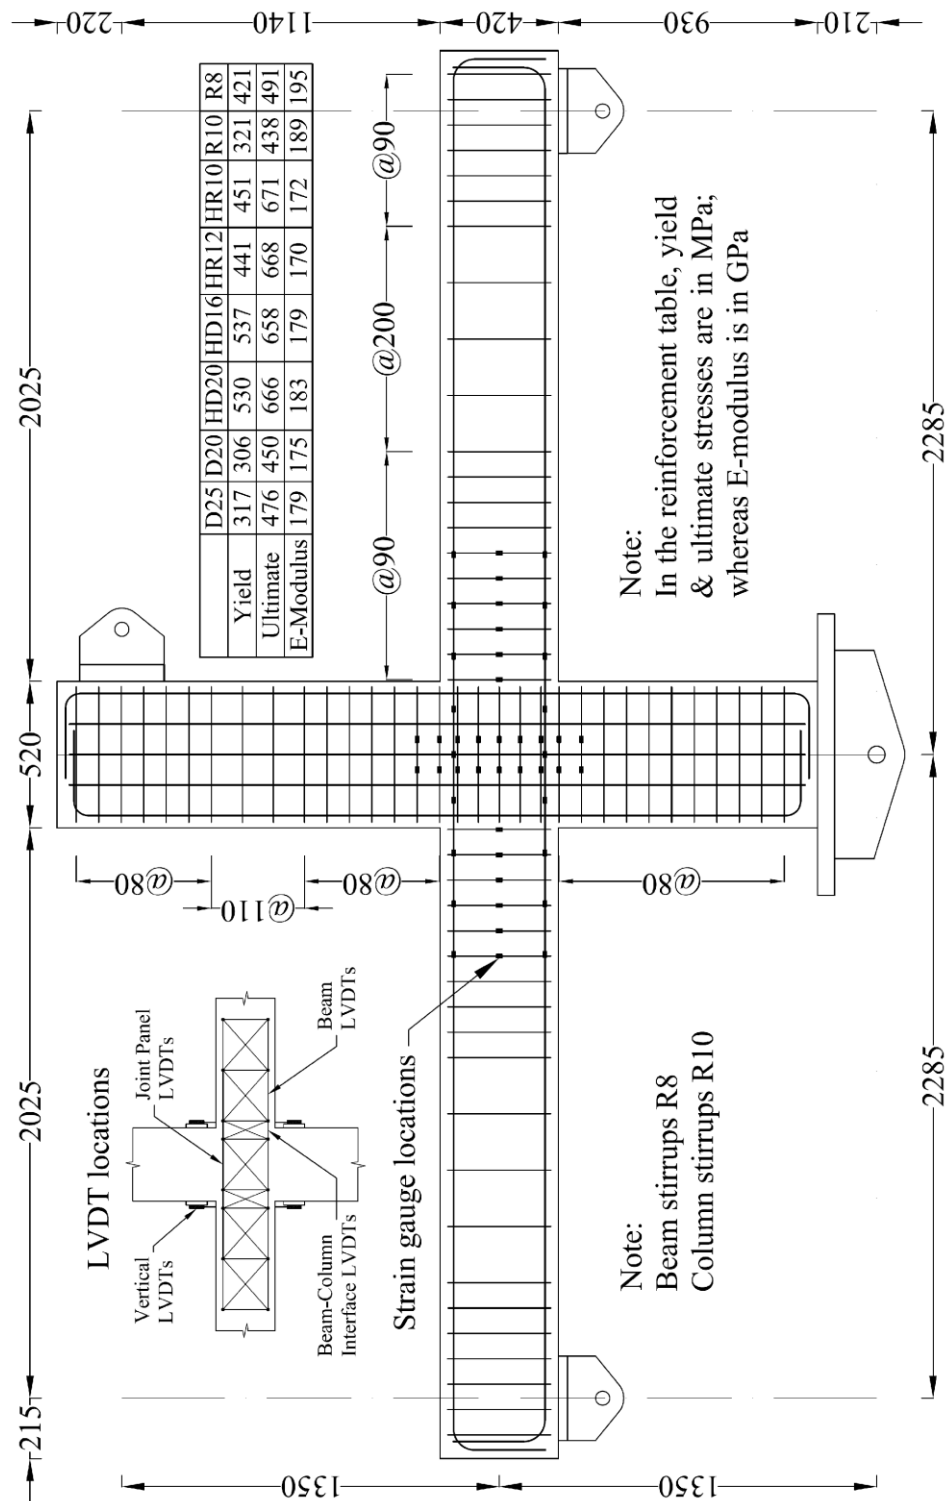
Typical details of reinforcement and instrumentation on a beam-column subassembly (dimensions are in ‘mm’)
